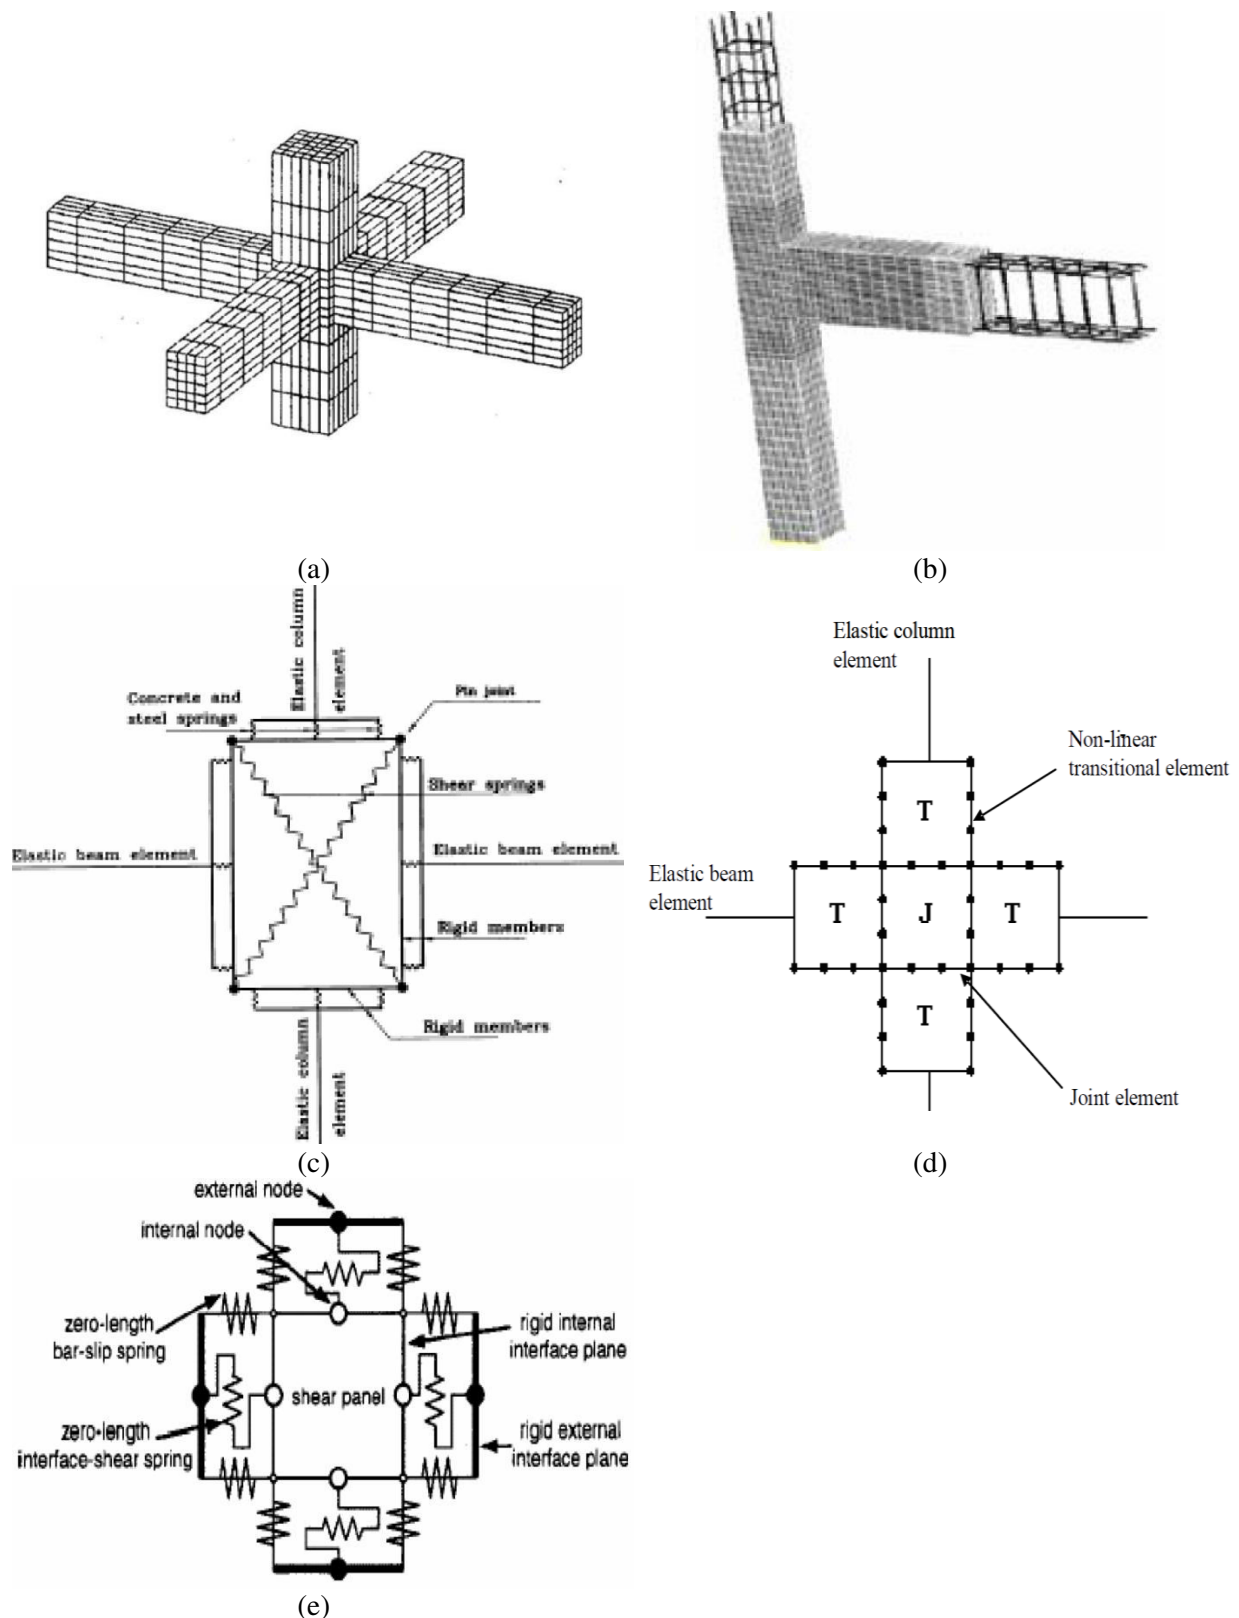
7: Alternative sophisticated beam-column joint models (a) Finite element model adopted by Nagai, 1996; (b) Model of test specimen adopted by Eligehausen et al, 2006;(c) Multi-spring model proposed by Youssef and Ghobarah, 2001;(d) Joint model proposed by Elmorsi, Kianoush and Tso, 2000; (e) Reinforcement concrete beam-column joint model adopted by Lowes et al., 2003
